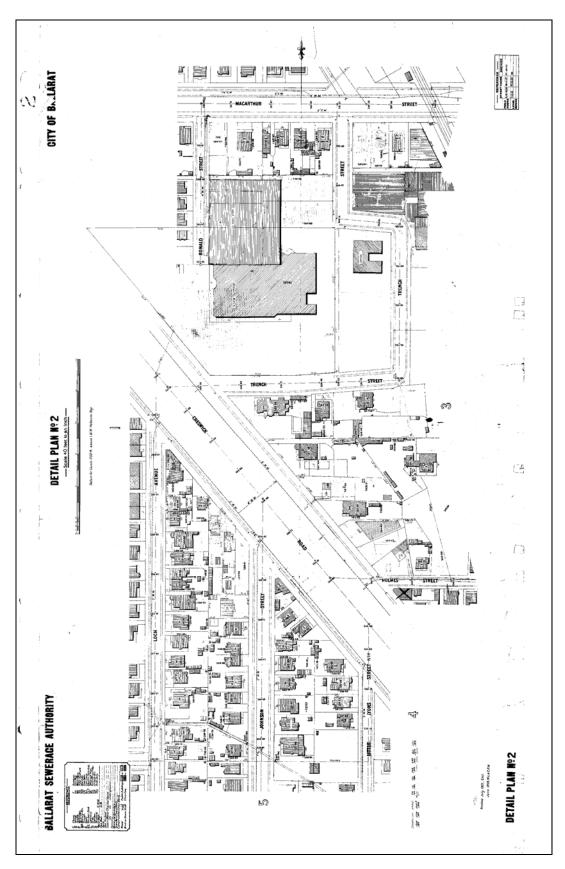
Ballarat Sewerage Authority Plan, 1922. Source: Planning Department, City of Ballarat.
